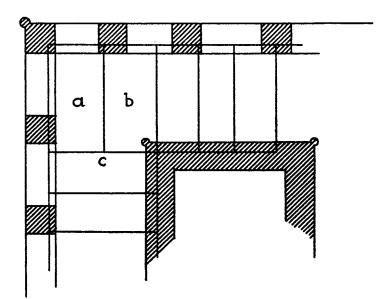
Plan of the Roof Slabs in the Northeast Corner of the Peripteros
